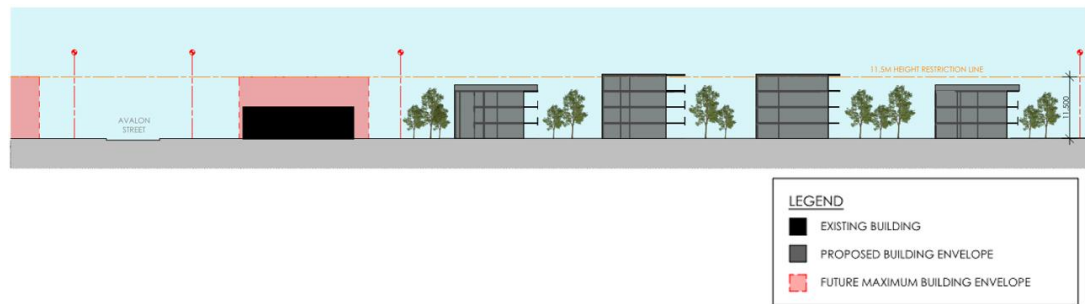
Section through subject site showing relationship to the adjoining area (Source: BHI Architects)
